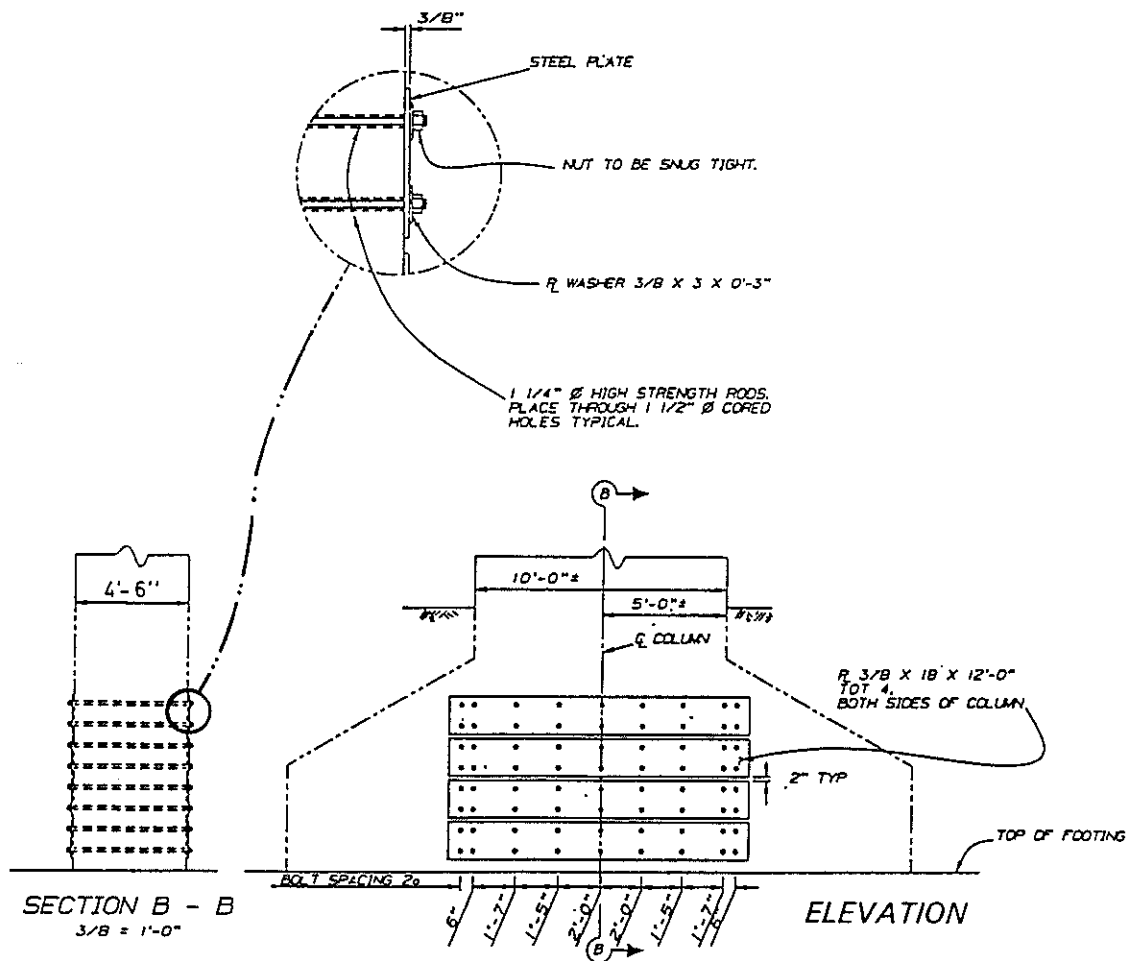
Column or pier wall retrofit using confinement through-bolted plates at the lap splices (Zelinski pers.comm. 1993).
